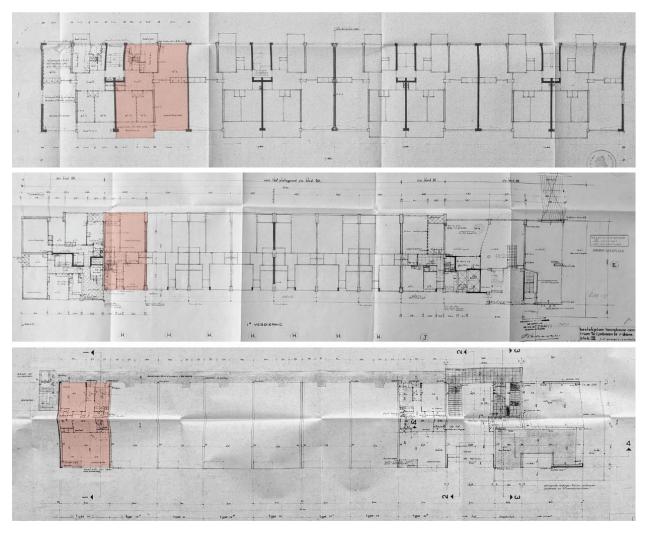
Building Case Study - Analyzed Segments of the Buildings
